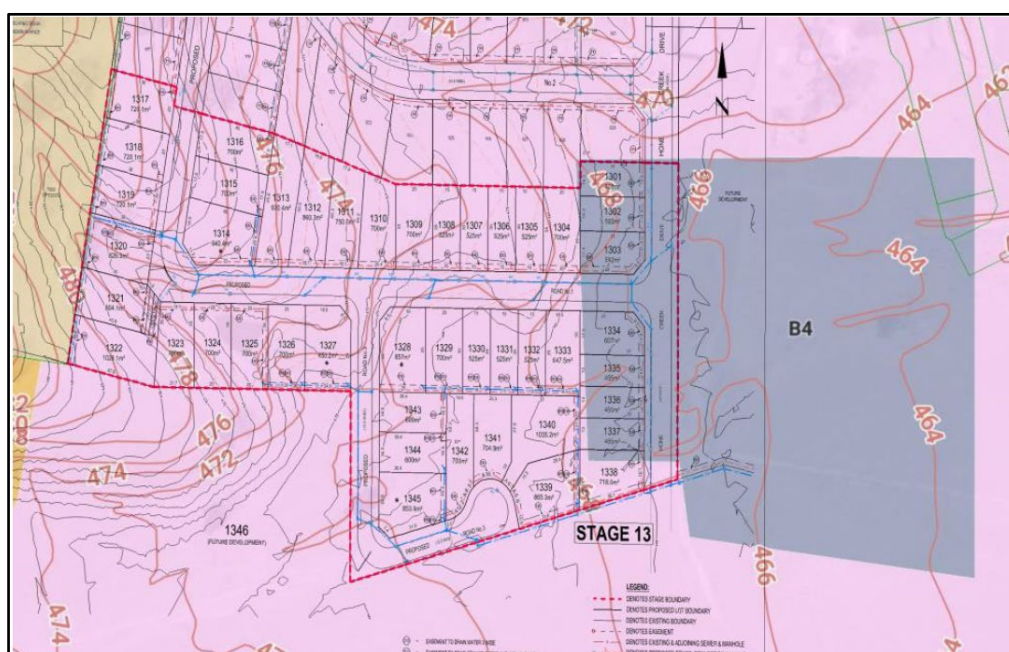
Land Zoning overlayed with proposed Stage 13 layout (Source: extract from SEE provided with application)
